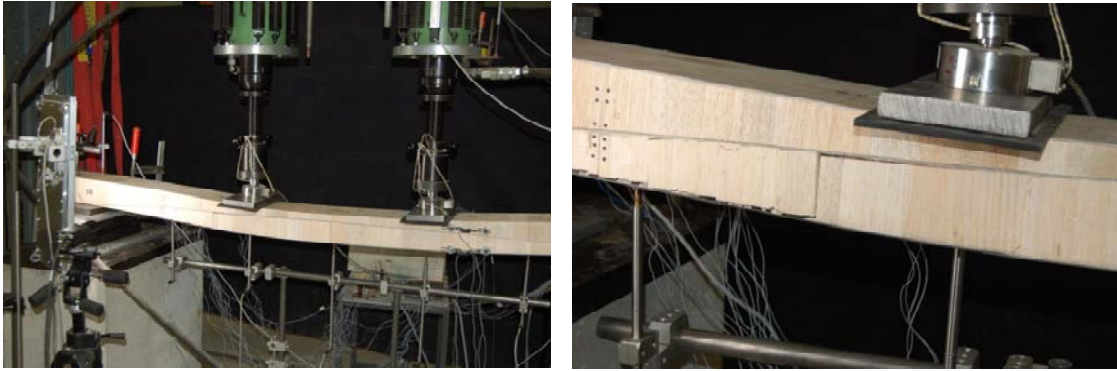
Failure of beam A-G-1 (left), zoom of detailed failure mode (right)
